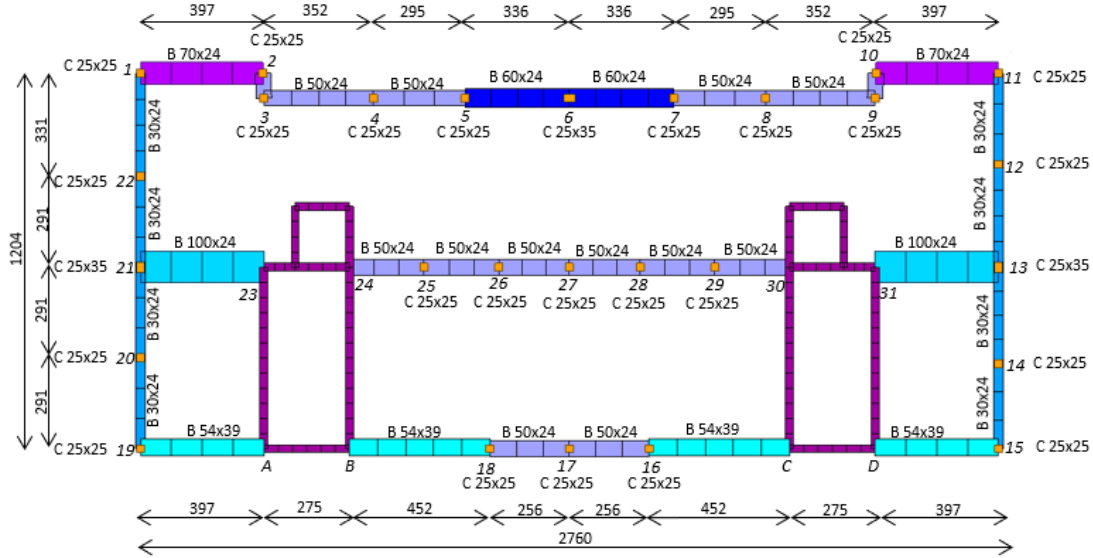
Structural plan of the finite element model of the case study – Type plan.
